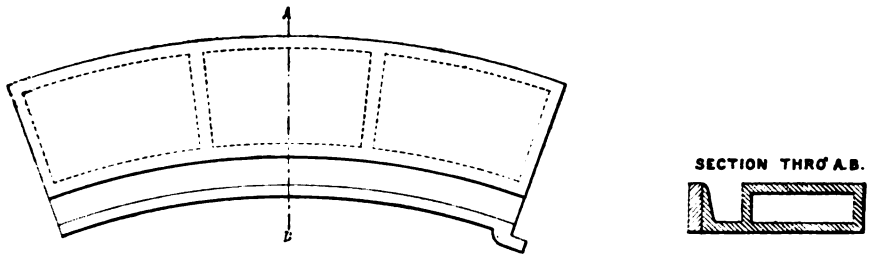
COMBINED WEDGING AND RING CRIB.
